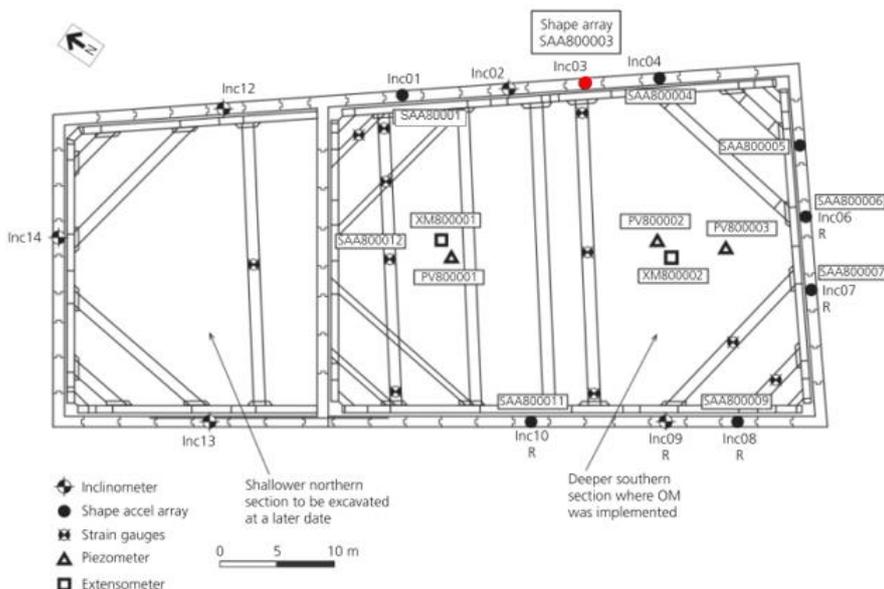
TCR-WTH instrument layout plan (Yeow et al. 2014)
